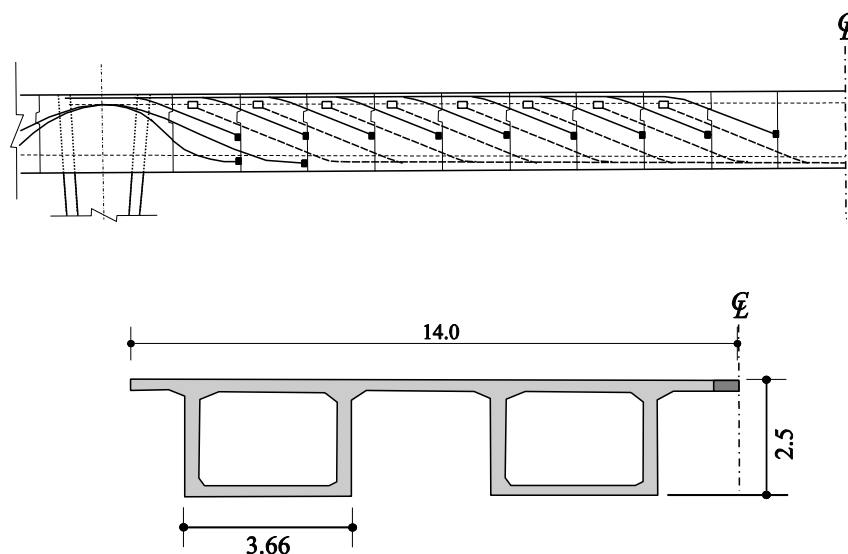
Longitudinal cable profile and cross-section of the Choisy-le-Roi bridge [Lacey et al. 1971]
